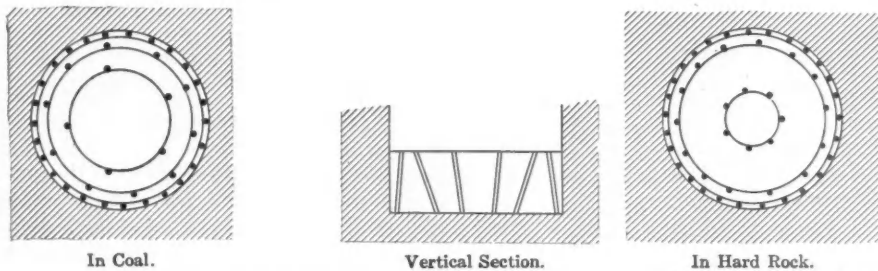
THE ENGLISH AND WELSH METHOD OF PLACING SHOT HOLES FOR CIRCULAR SHAFTS
